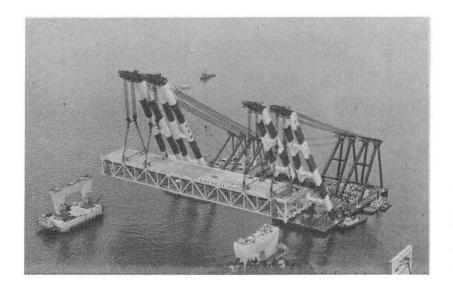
Large block erection: side span of the Iwakuro Island Bridge (courtesy of the Honshu-Shikoku Bridge Authority)
